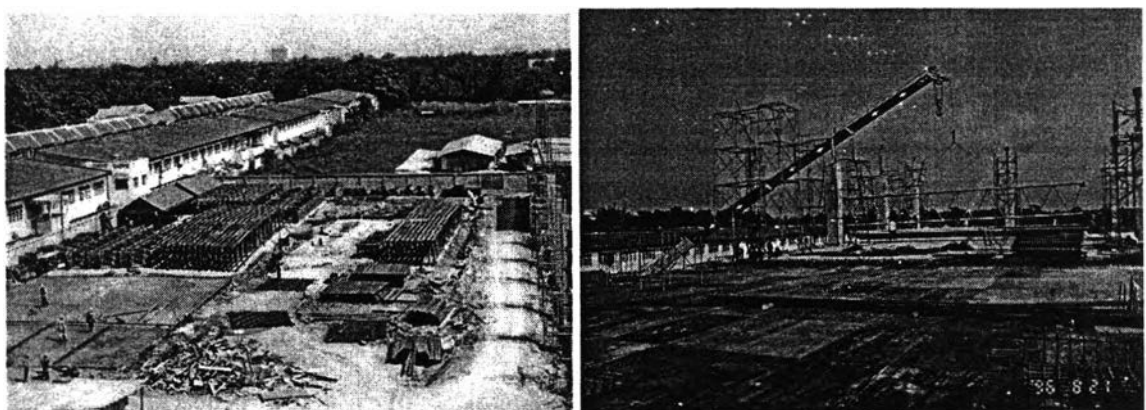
A mobile crane stands besides the factory building to install roof-trusses.
